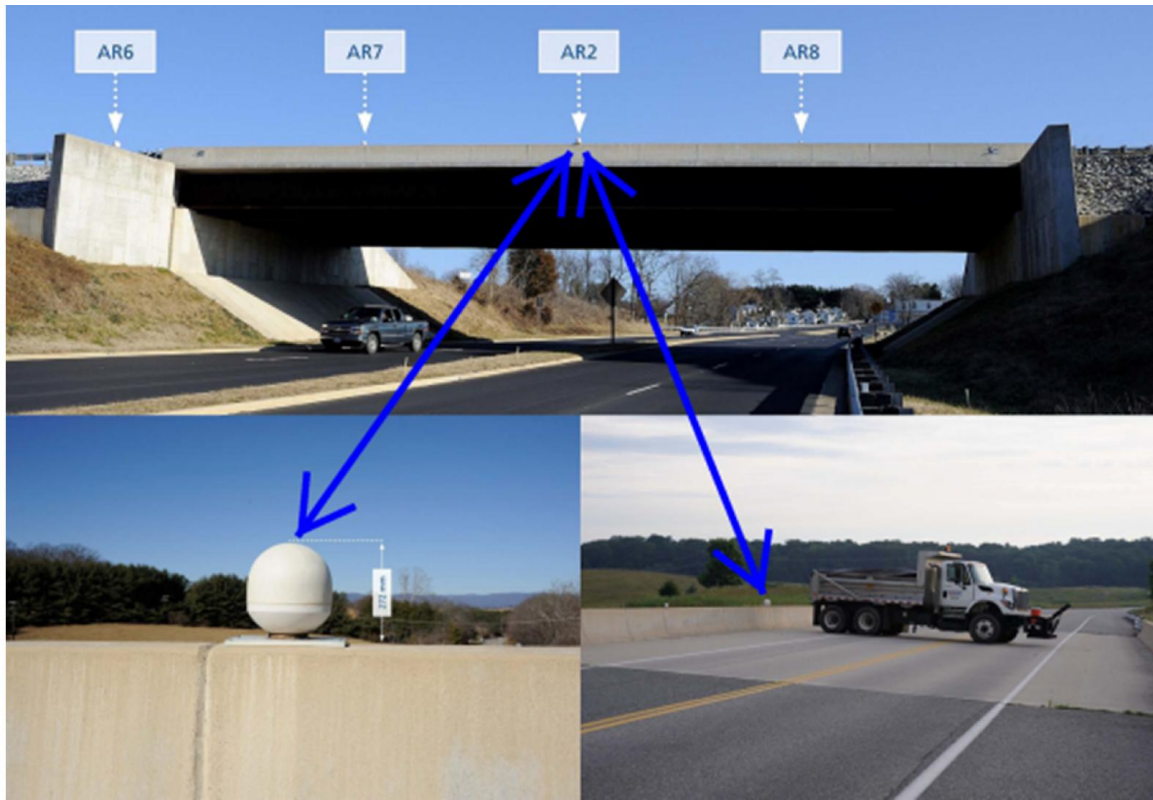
Load test setup at the Route 262 bridge over Route 250.
